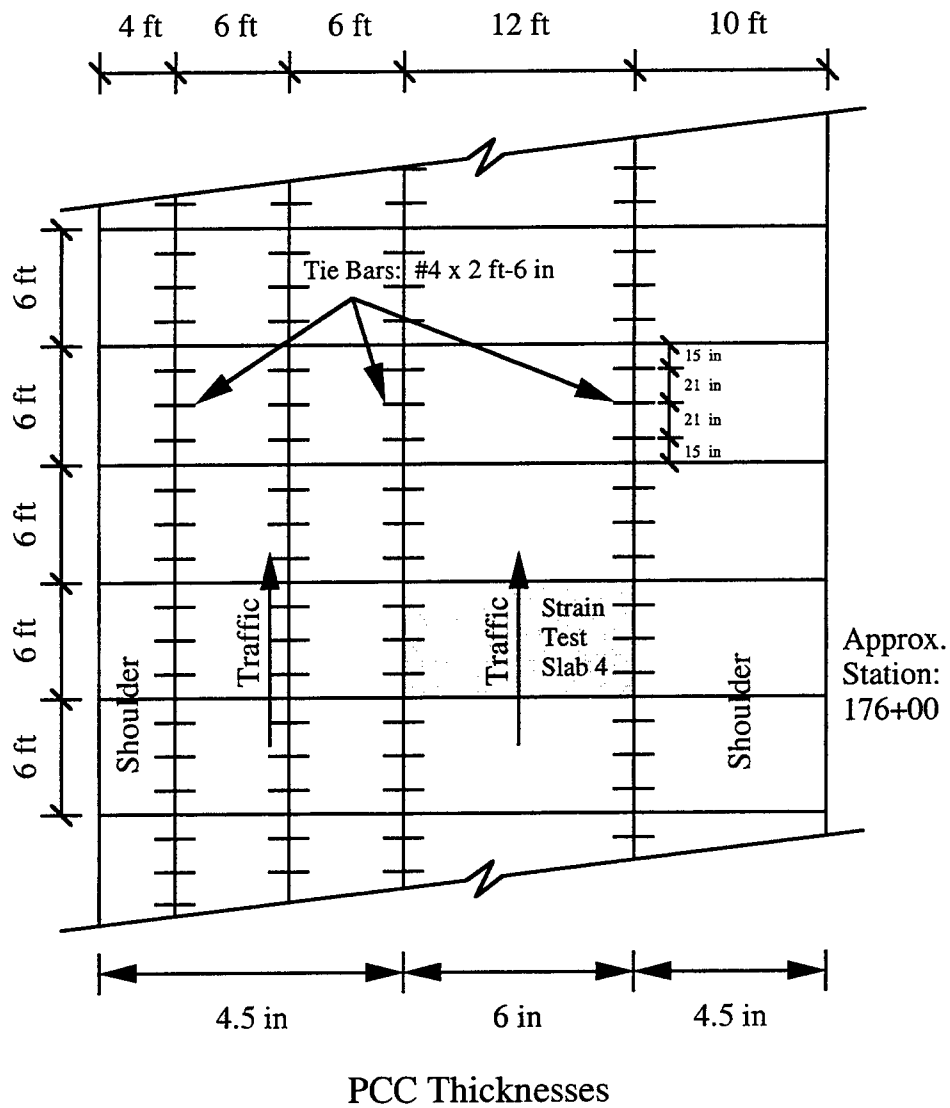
Test Slab 4 Layout for CDOT Project #2.
